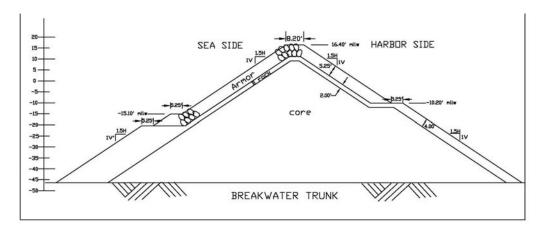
The Breakwater Trunk Cross Section is common to Alternatives 1 and 4.
